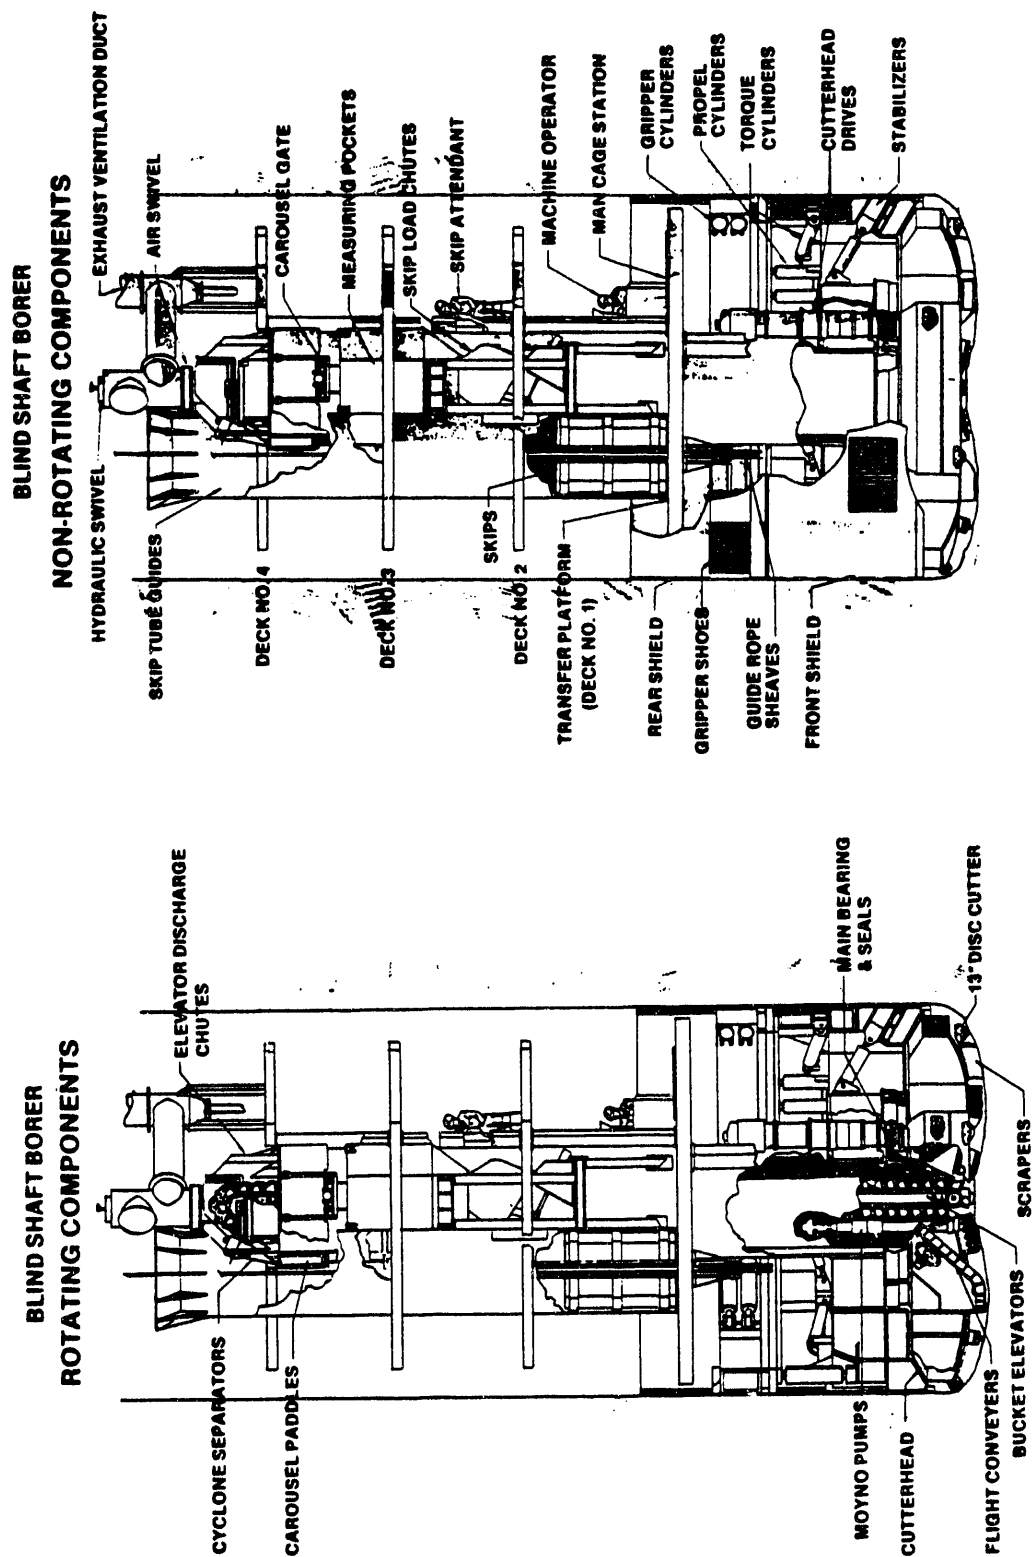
Schematic Drawing of the Rotating Components of a Blind Shaft Borer
